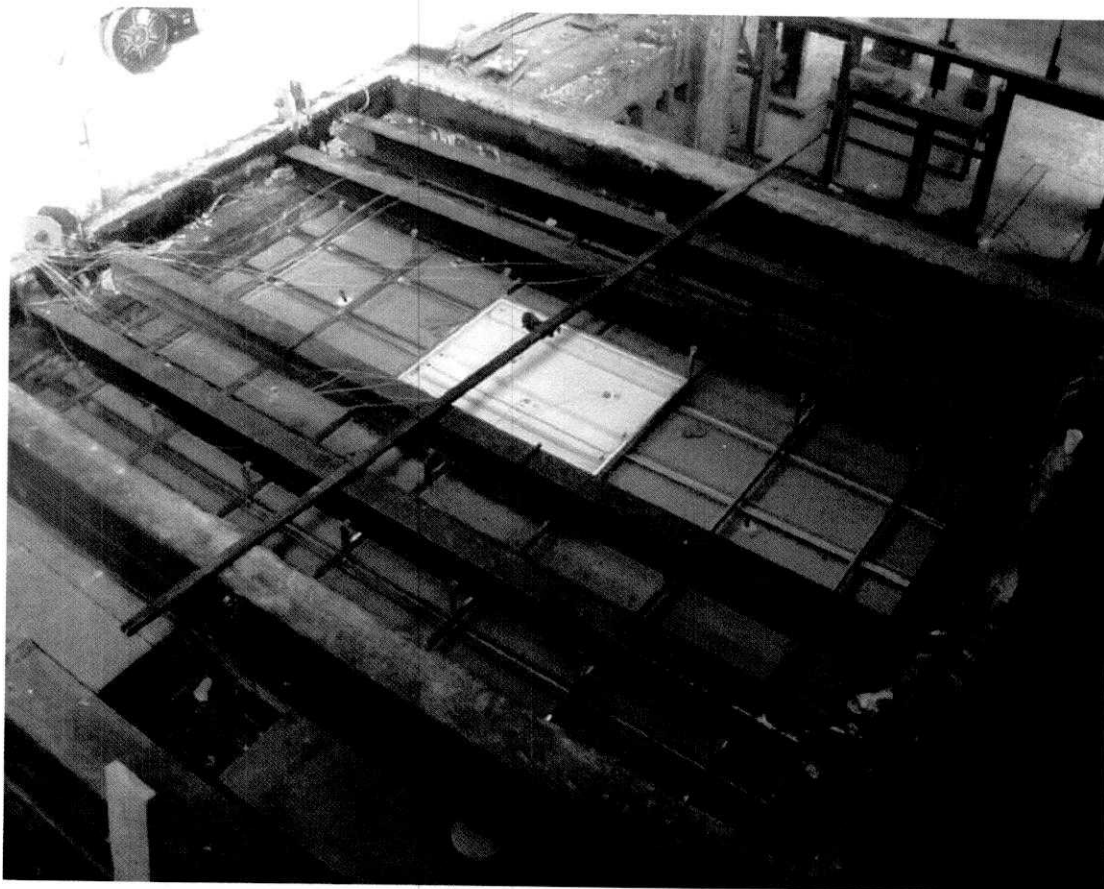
Exposed face of specimen before test showing furnace thermocouple locations
